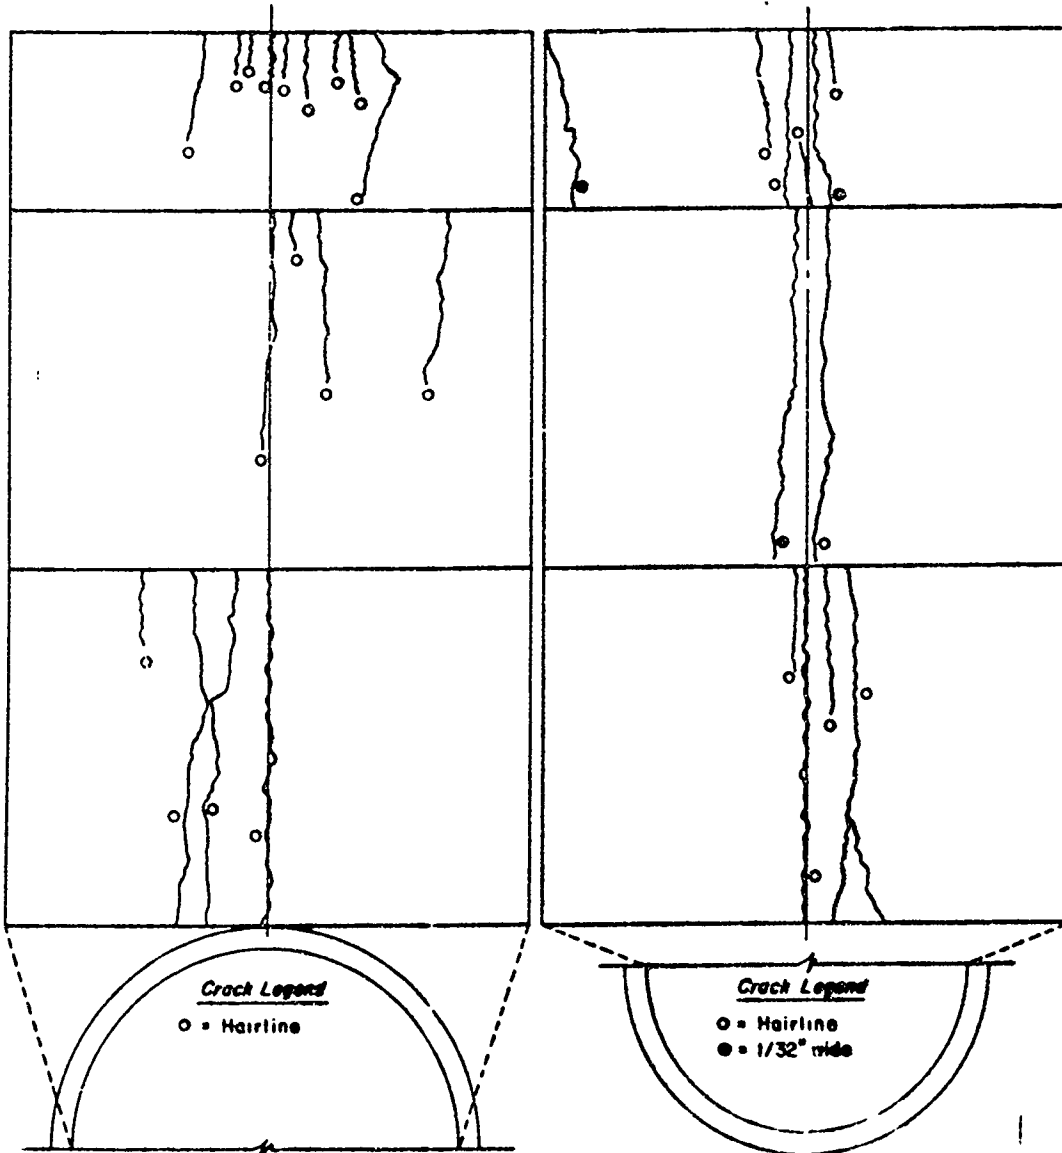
Crack survey of top half, developed; concrete Conduit 3.2j.
